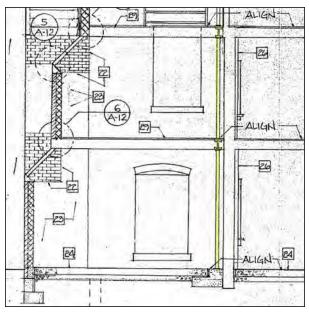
C-6: Section from 1980s drawings. Interior beams and columns highlighted in yellow.
